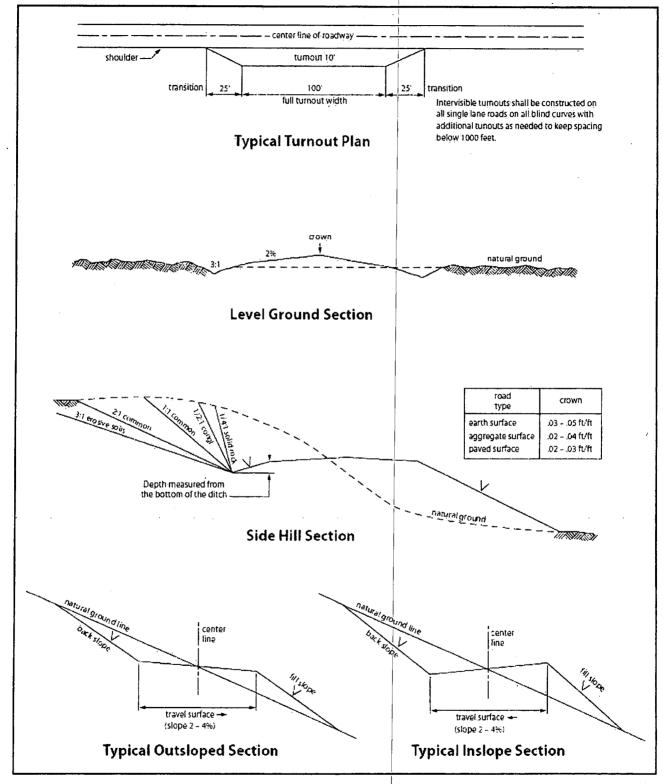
Cross-sections and plans for typical road sections representative of BLM resource or FS local and higher-class roads.
